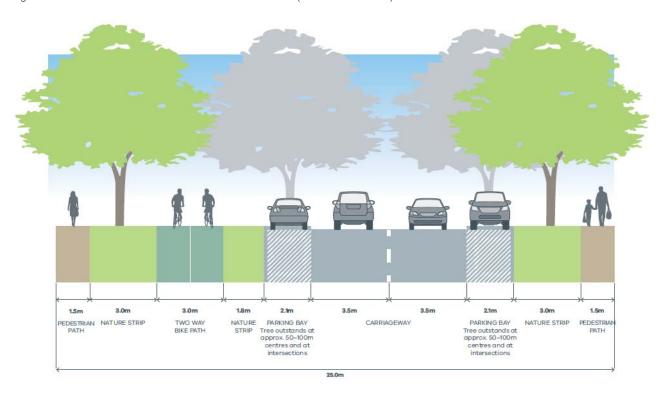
Industrial Boulevard Connector Street Cross-Section (east side of IN-02)
